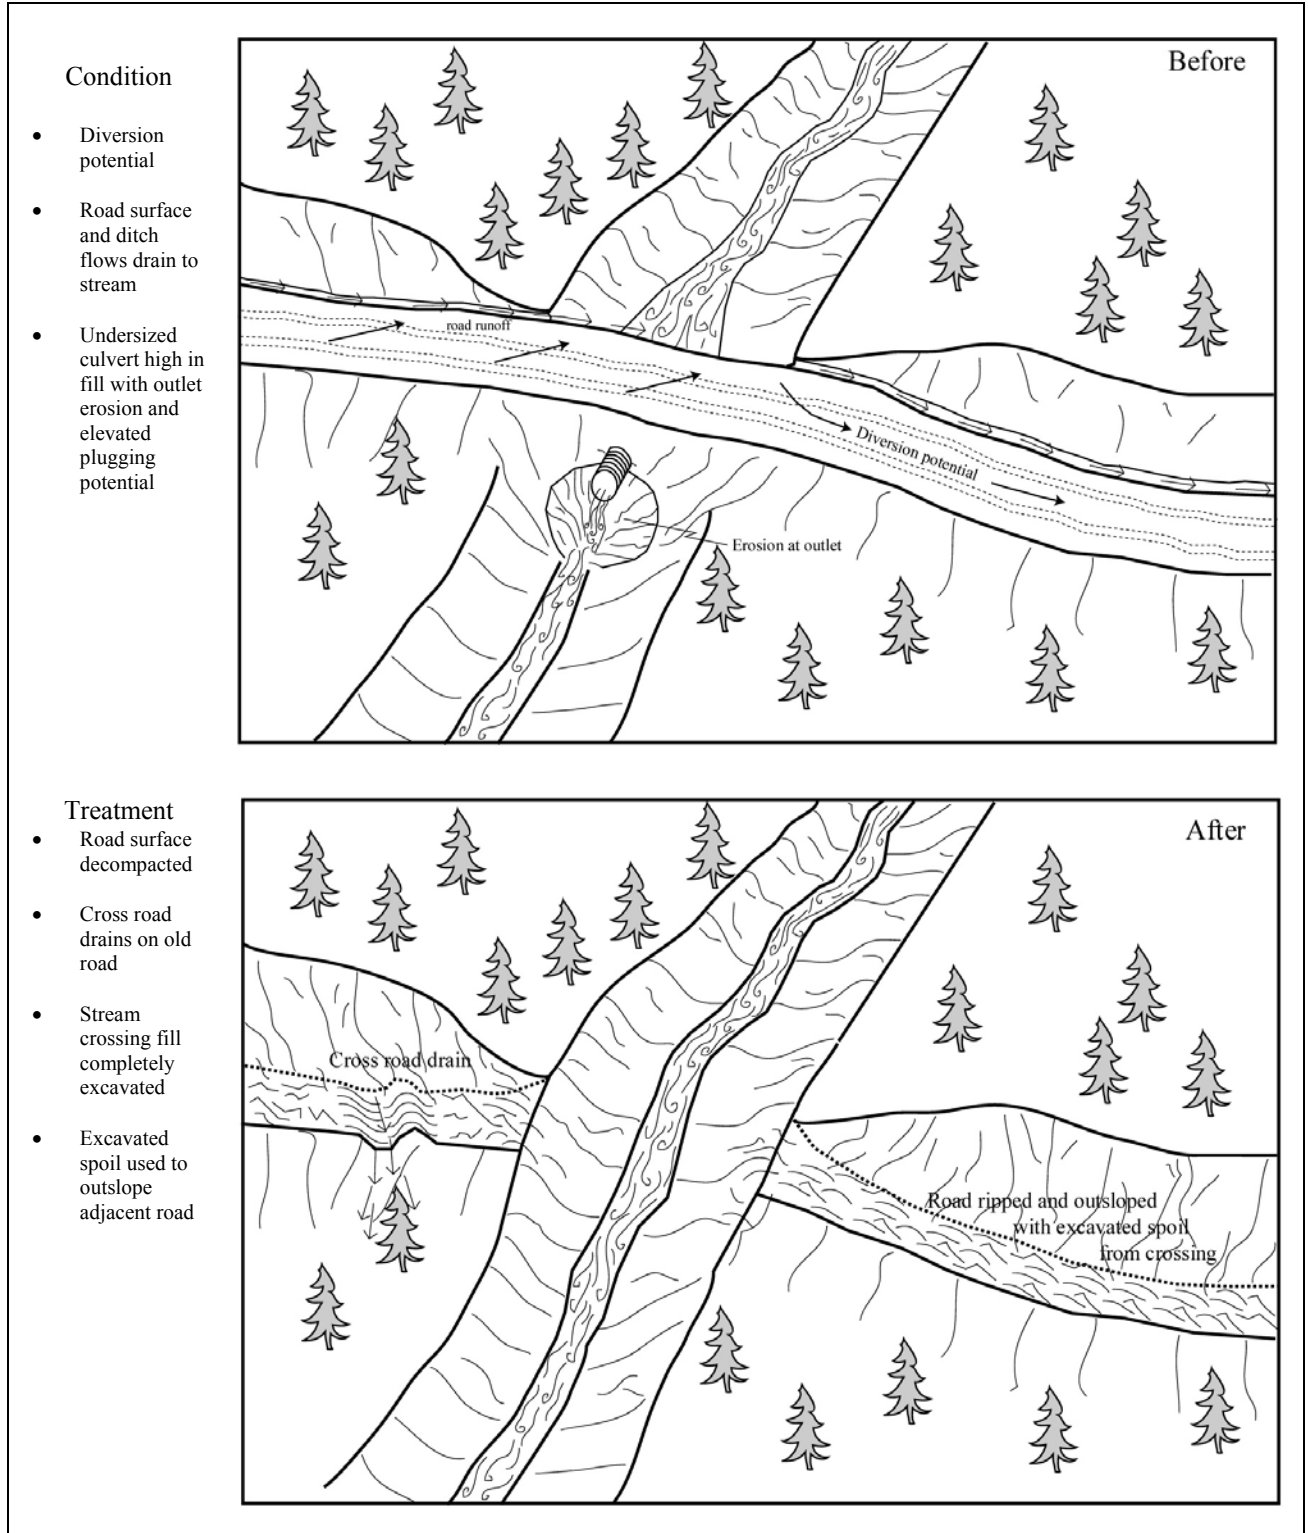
Typical stream crossing excavation on a decommissioned road.
